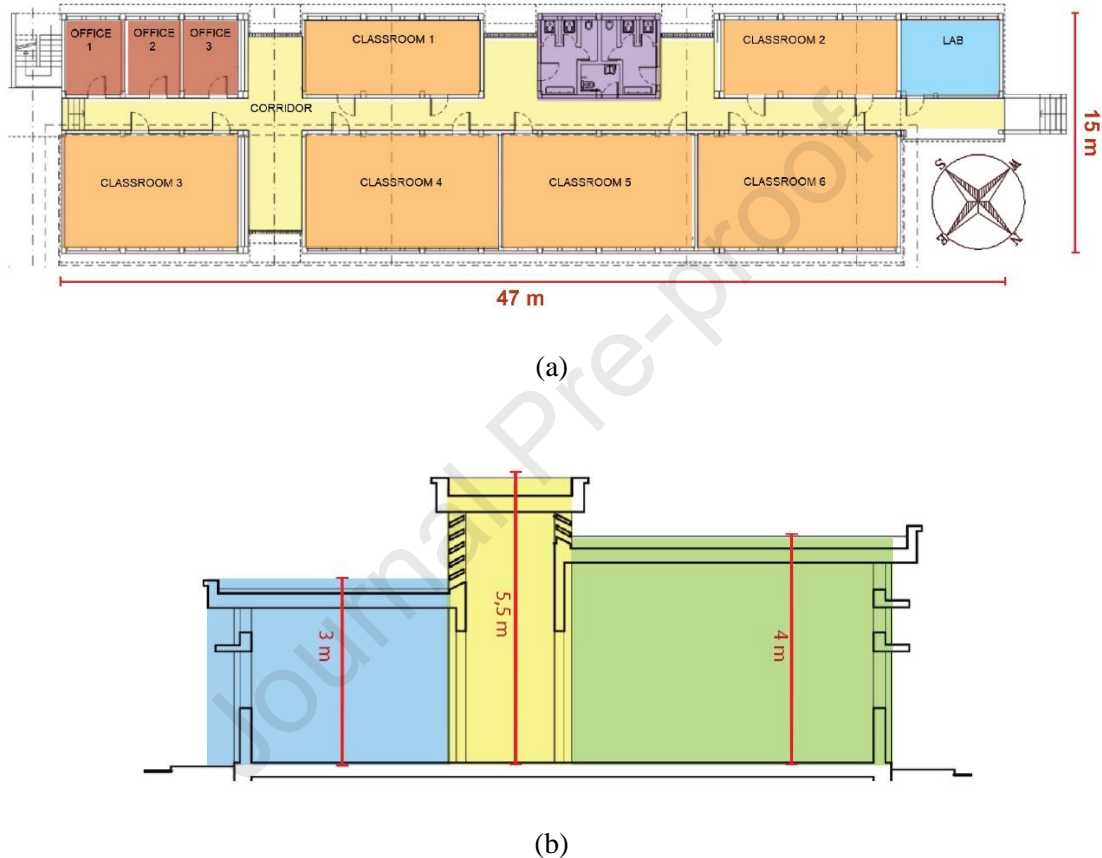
Layout of the reference building: (a) Plan view and (b) Cross sectional view.
